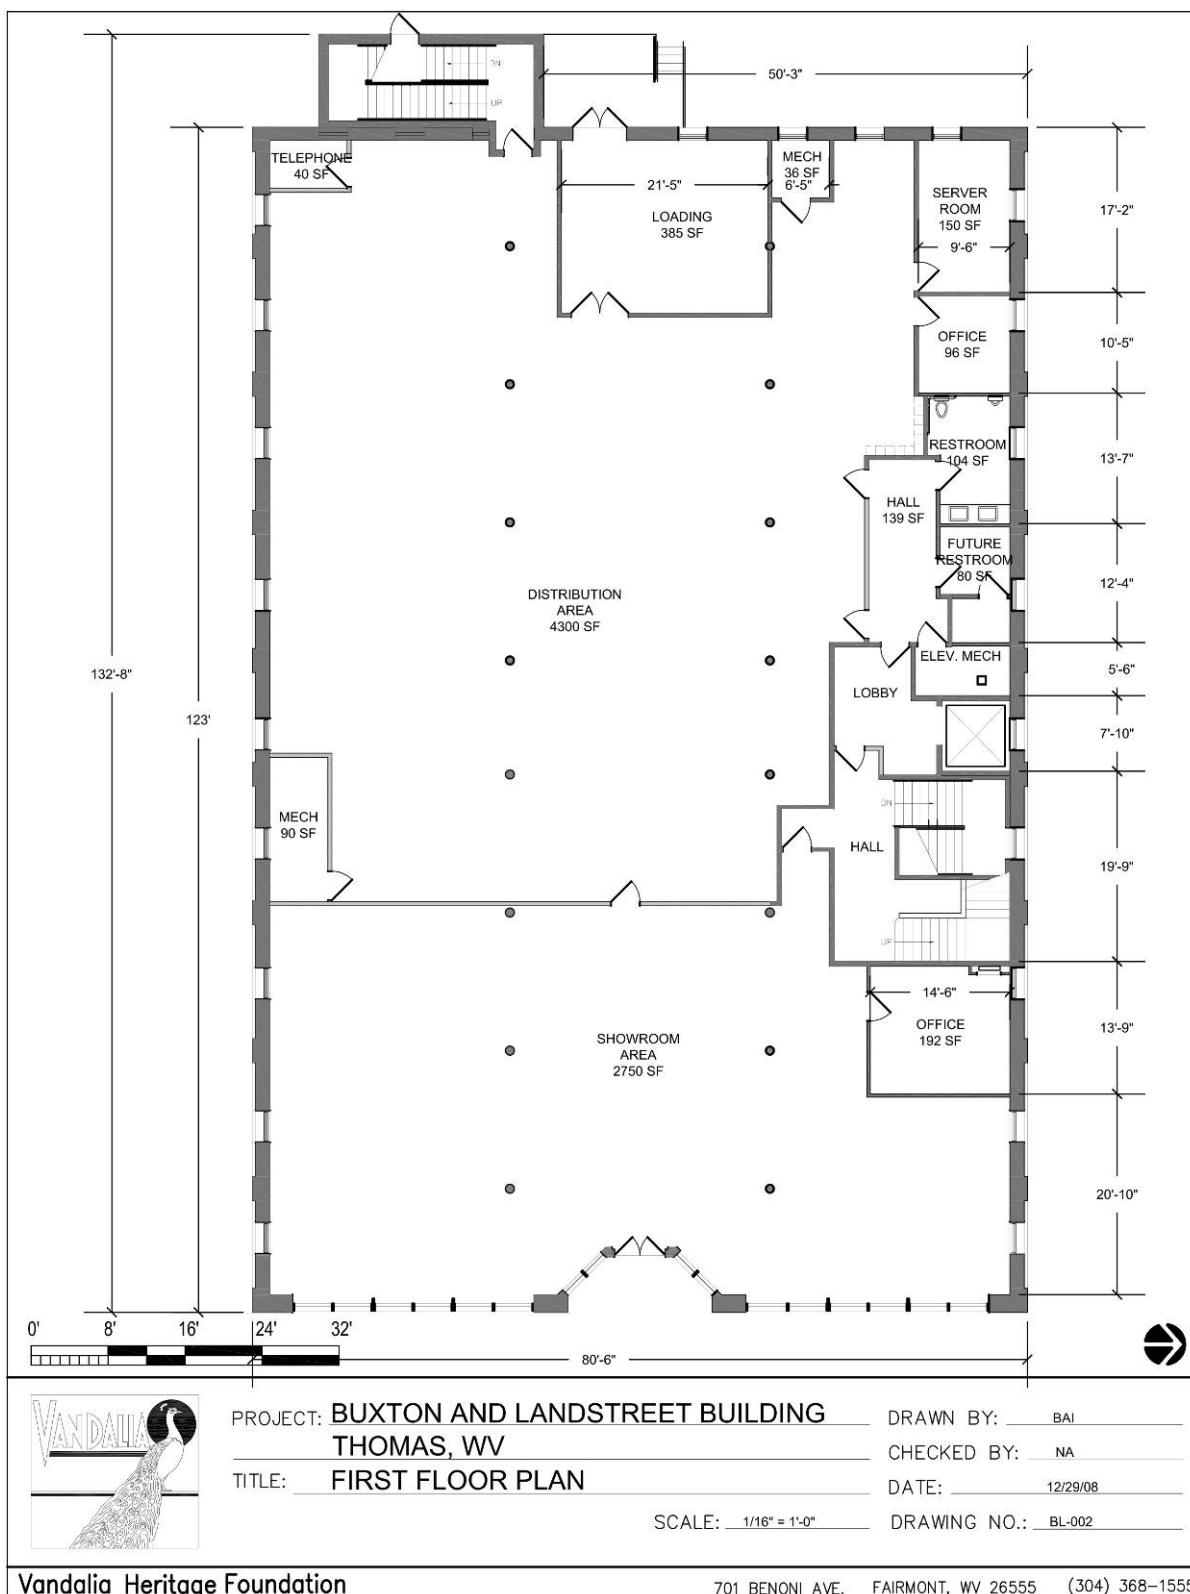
Buxton and Landstreet Company Store Floor Plan, First Floor
